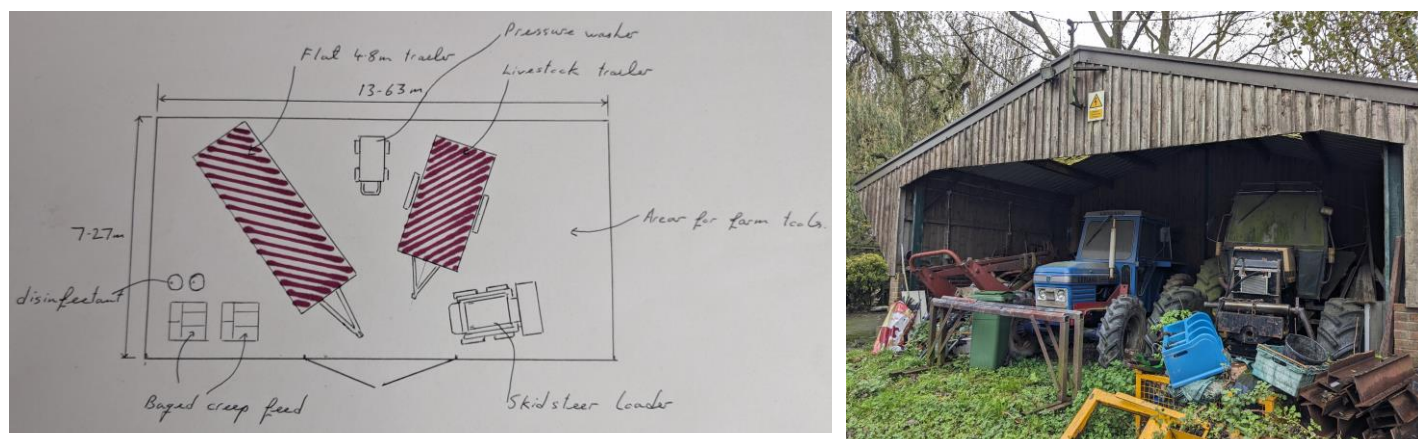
Sketch Plan and Photo of Building E as existing (currently sited on land north of Holme Road)
